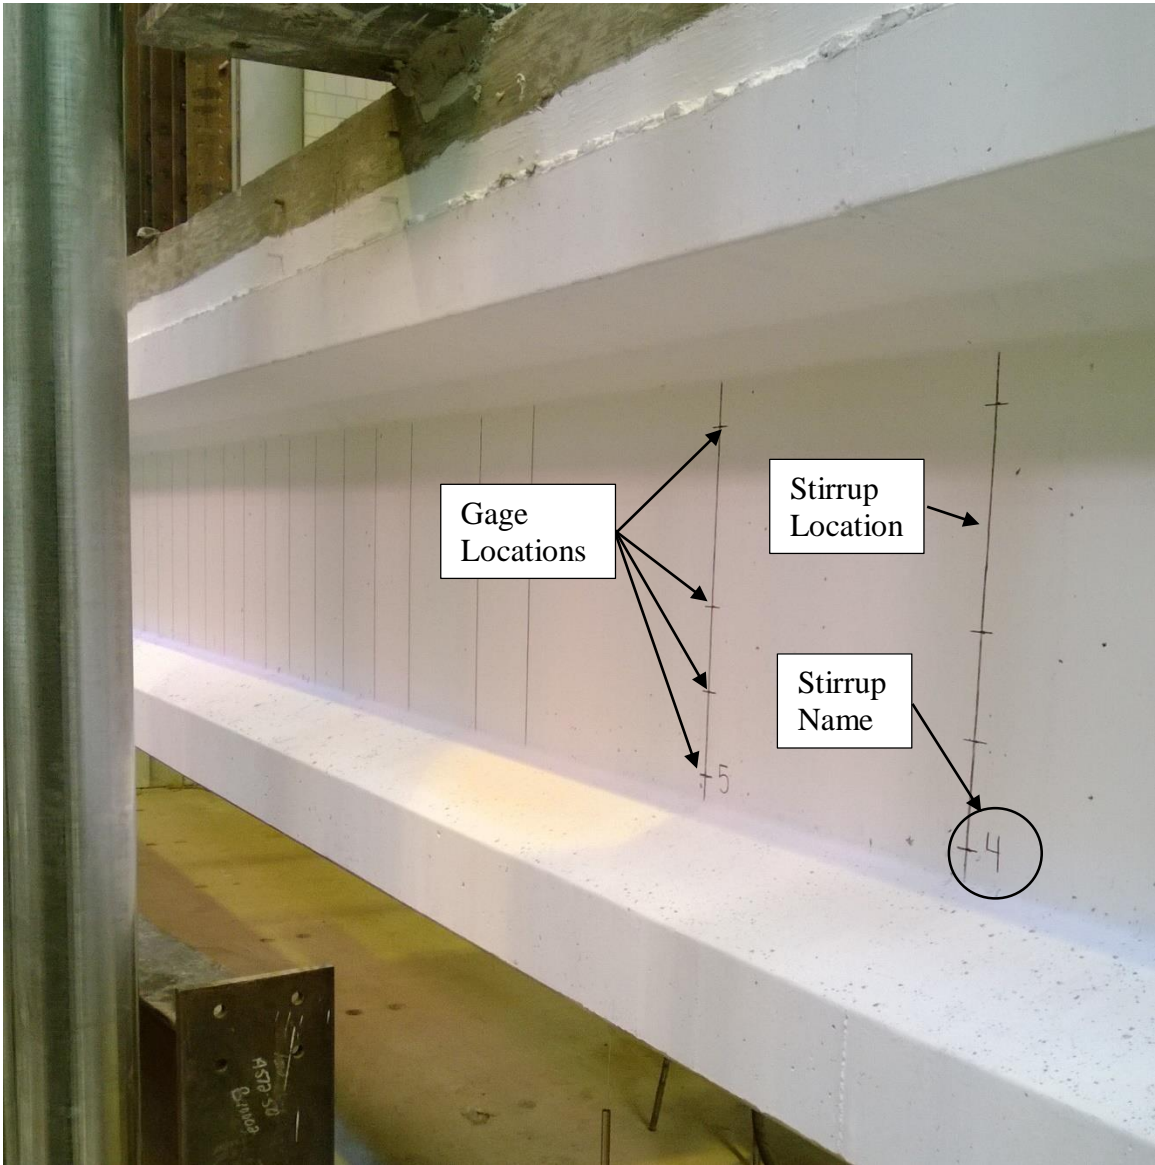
Grid pattern used to denote stirrup and gage locations for 45M_24W. Typical of all girders.
